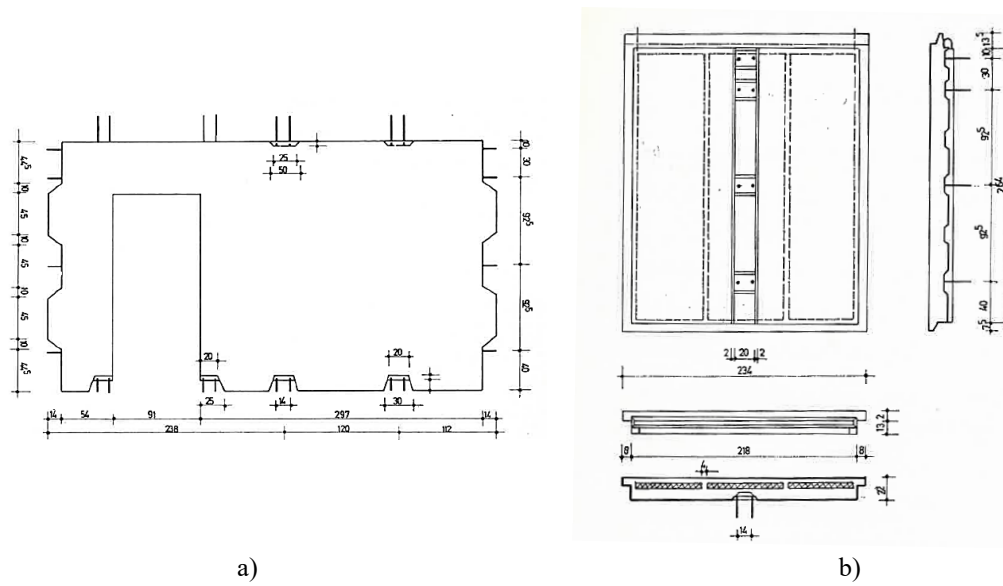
Prefabricated wall panels, “Potkovića” building in New Belgrade (HG-68 variant): a) interior wall panel and b) exterior wall panel [23]
